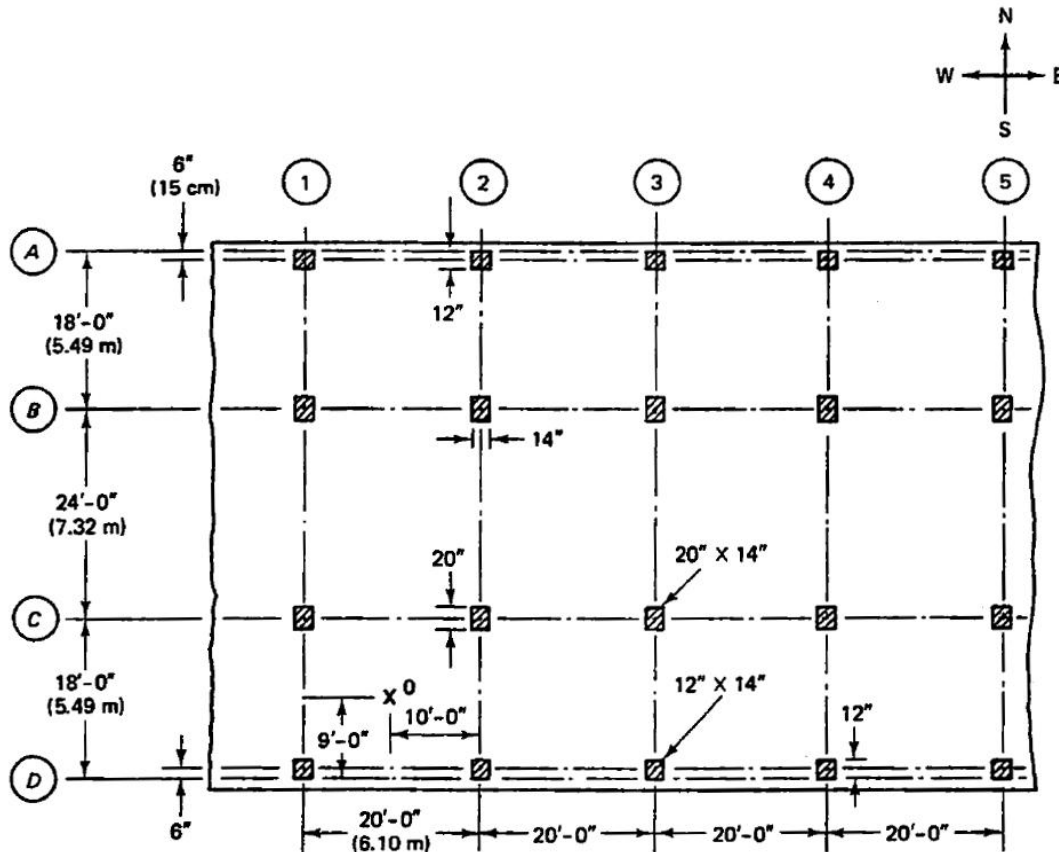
Two-way post-tensioned floor plan in Example 9.3
